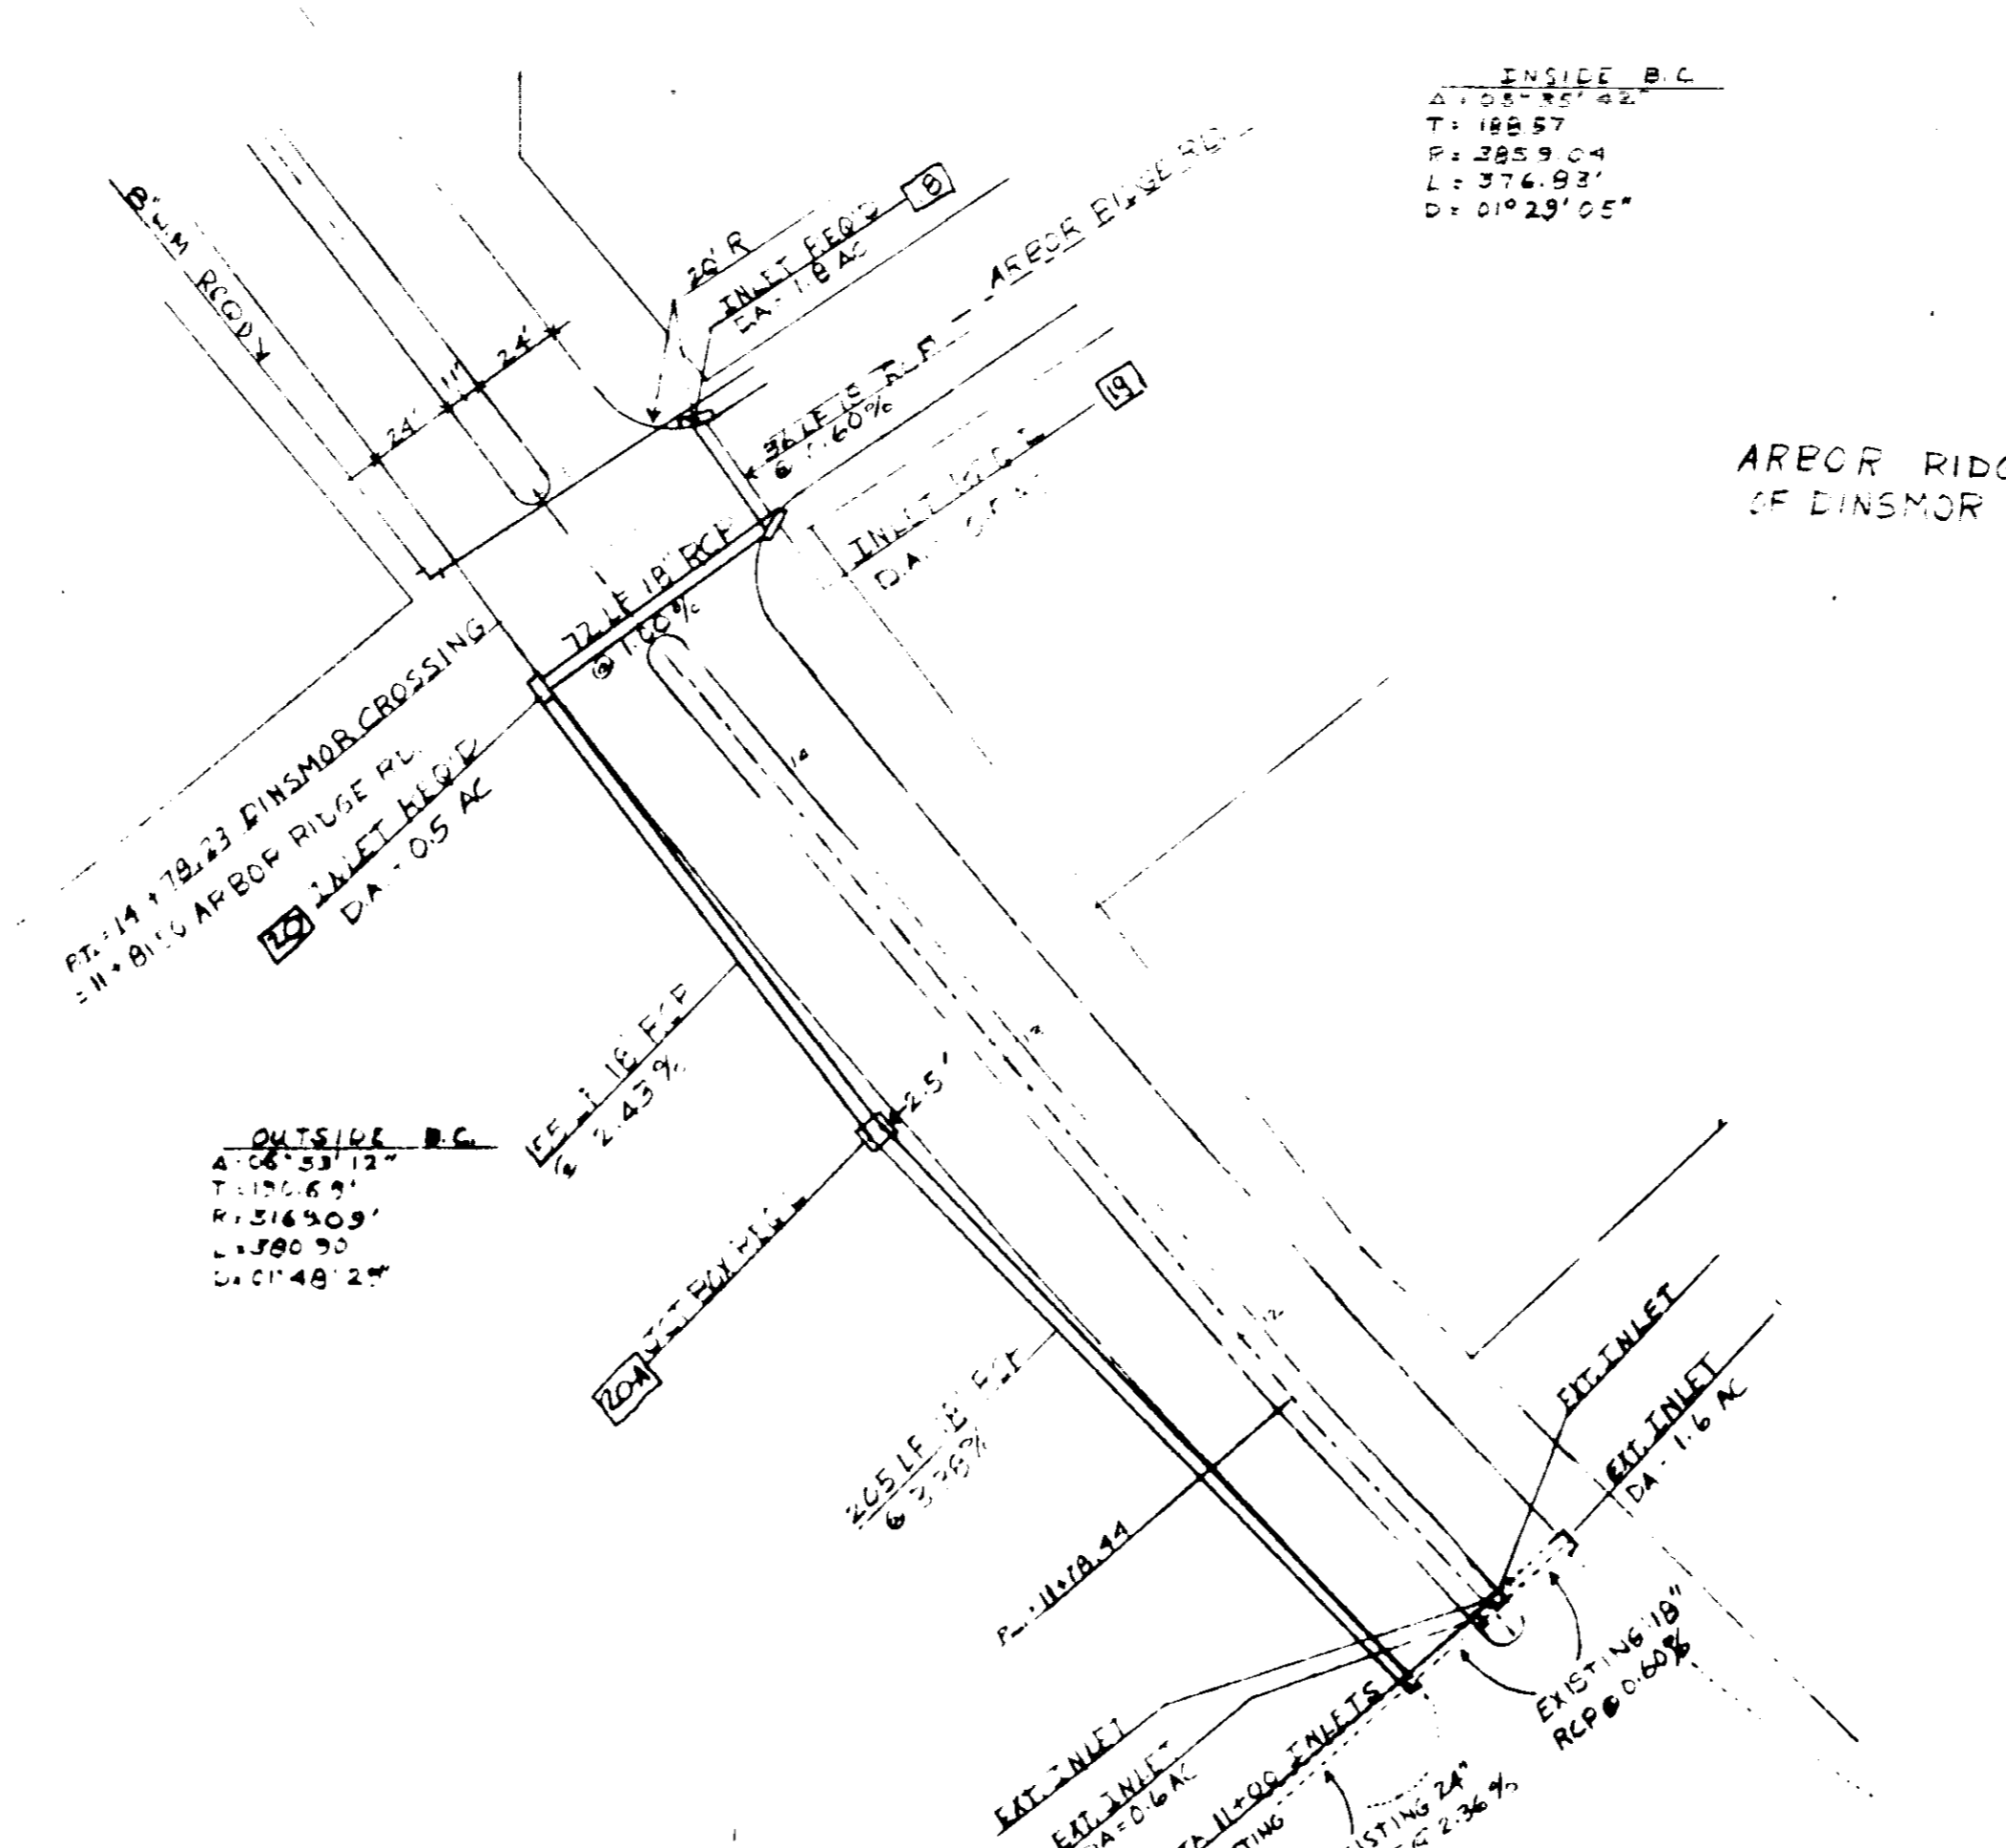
SINGLE PLAN AND PROFILE - FULL LINE
